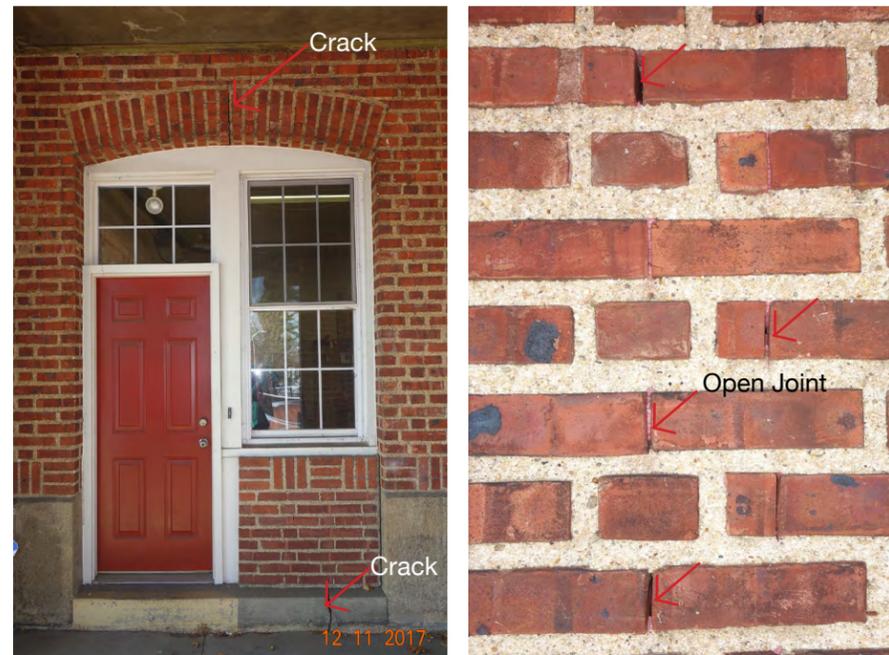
7 East Facade - Crack at Arch Head & Step (left), Open Jts (right)
